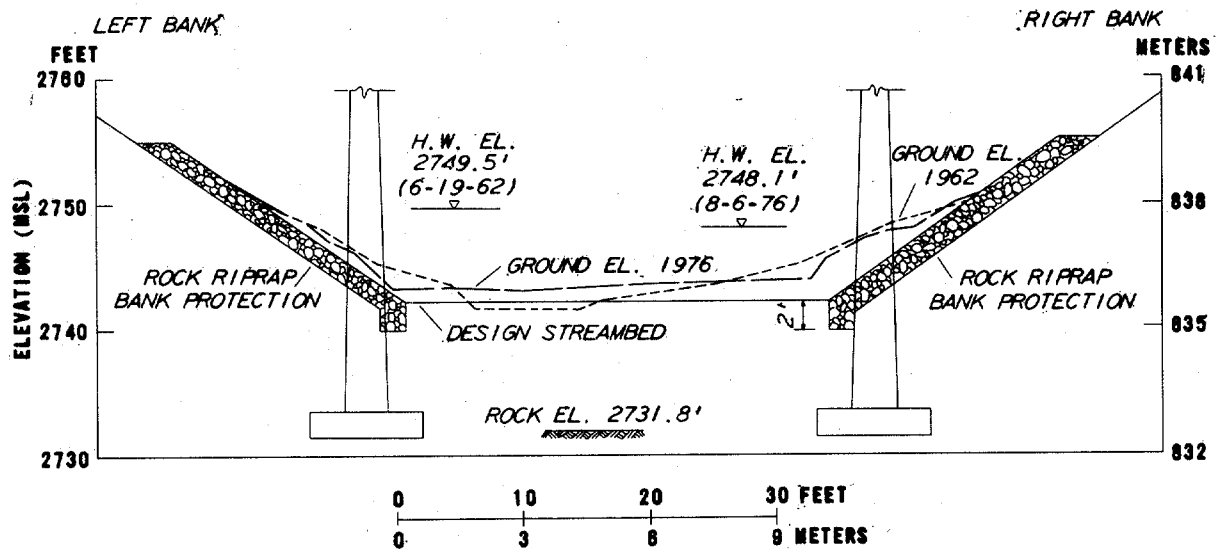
Changes in cross section of channel at downstream side of bridge between 1956 and 1976, Rabbit Creek.
